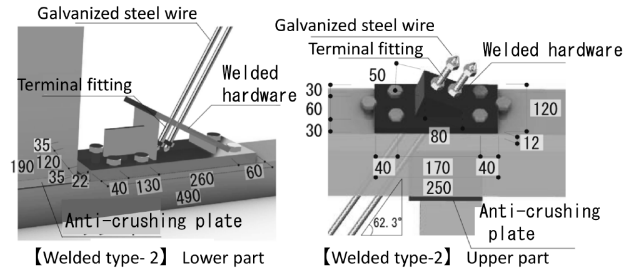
Structures of anchoring fittings [welded type - 2 wires]
